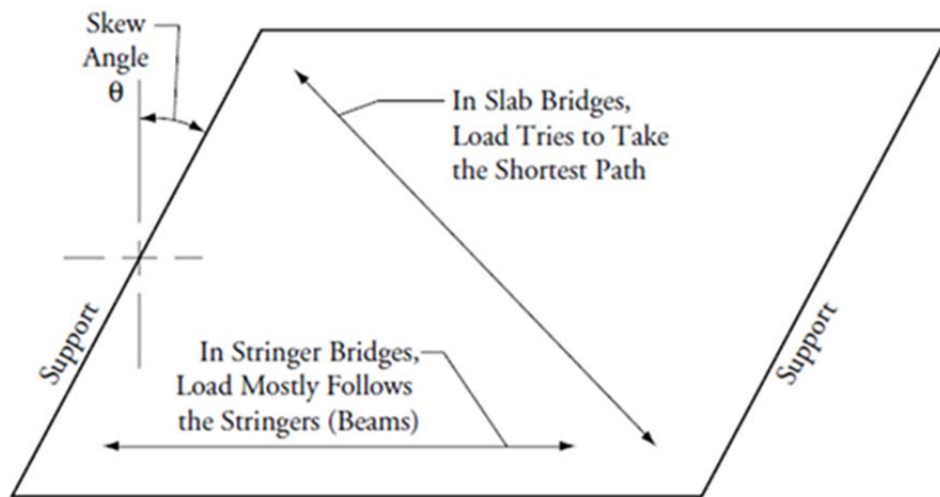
Load Path on a Skewed Bridge (Precast/Prestressed Concrete Institute, 2003)
